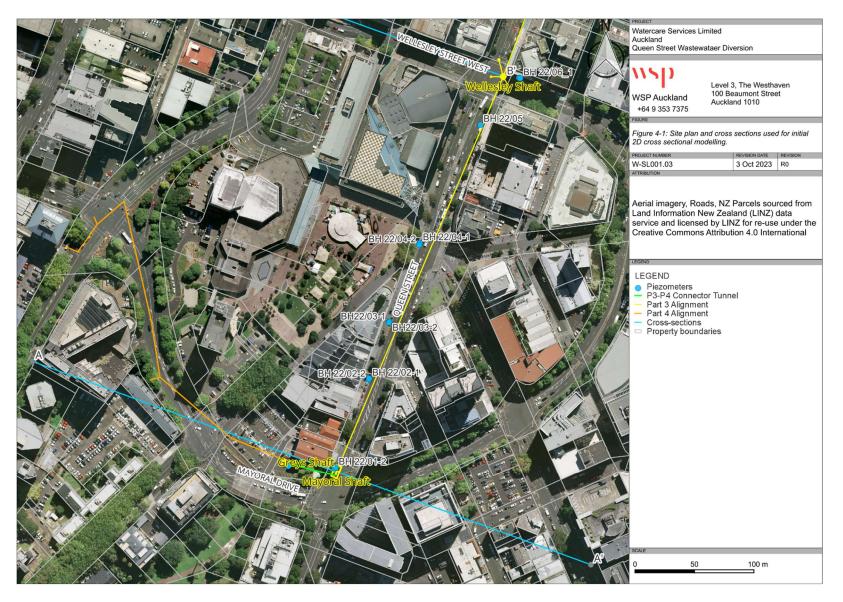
Site plan and cross sections used for initial 2D cross sectional modelling.
